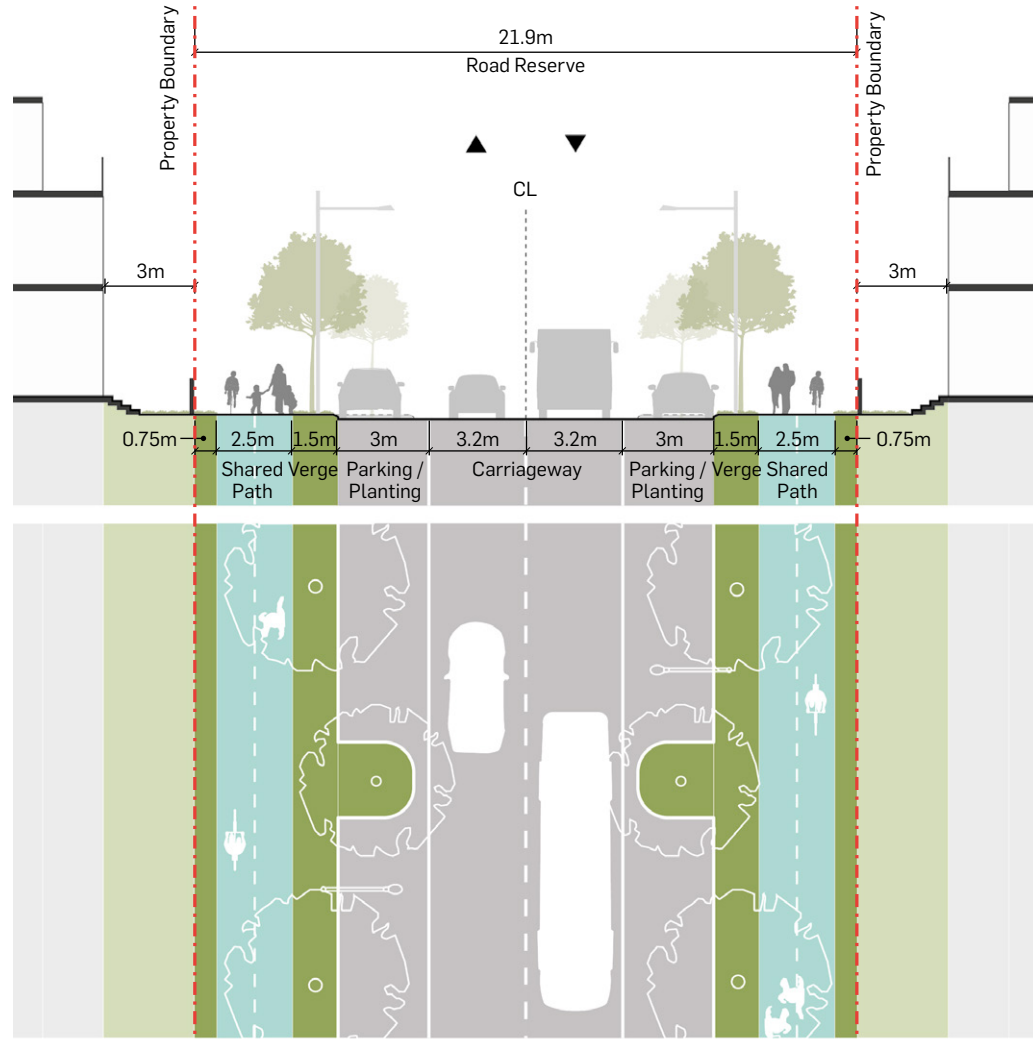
Indicative Street Section C-C' - Major Collector Road - Type 3
